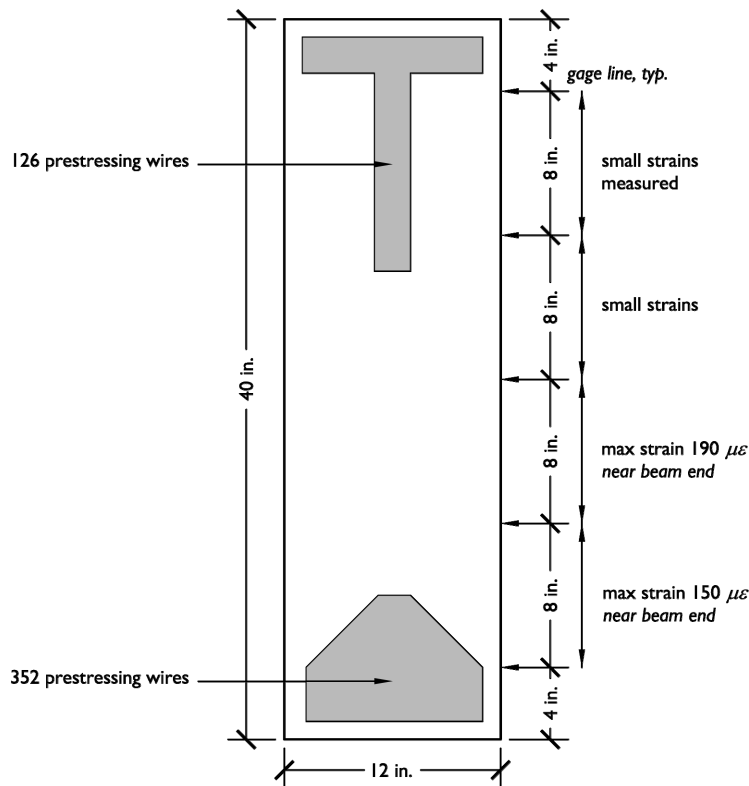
Bursting & spalling strains in Base rectangular beam
